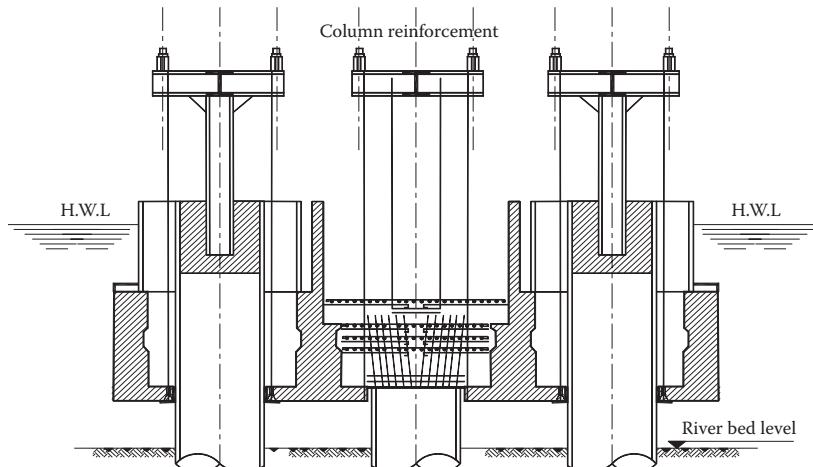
Pouring of some piles monolithically with pile cap (step 19).
